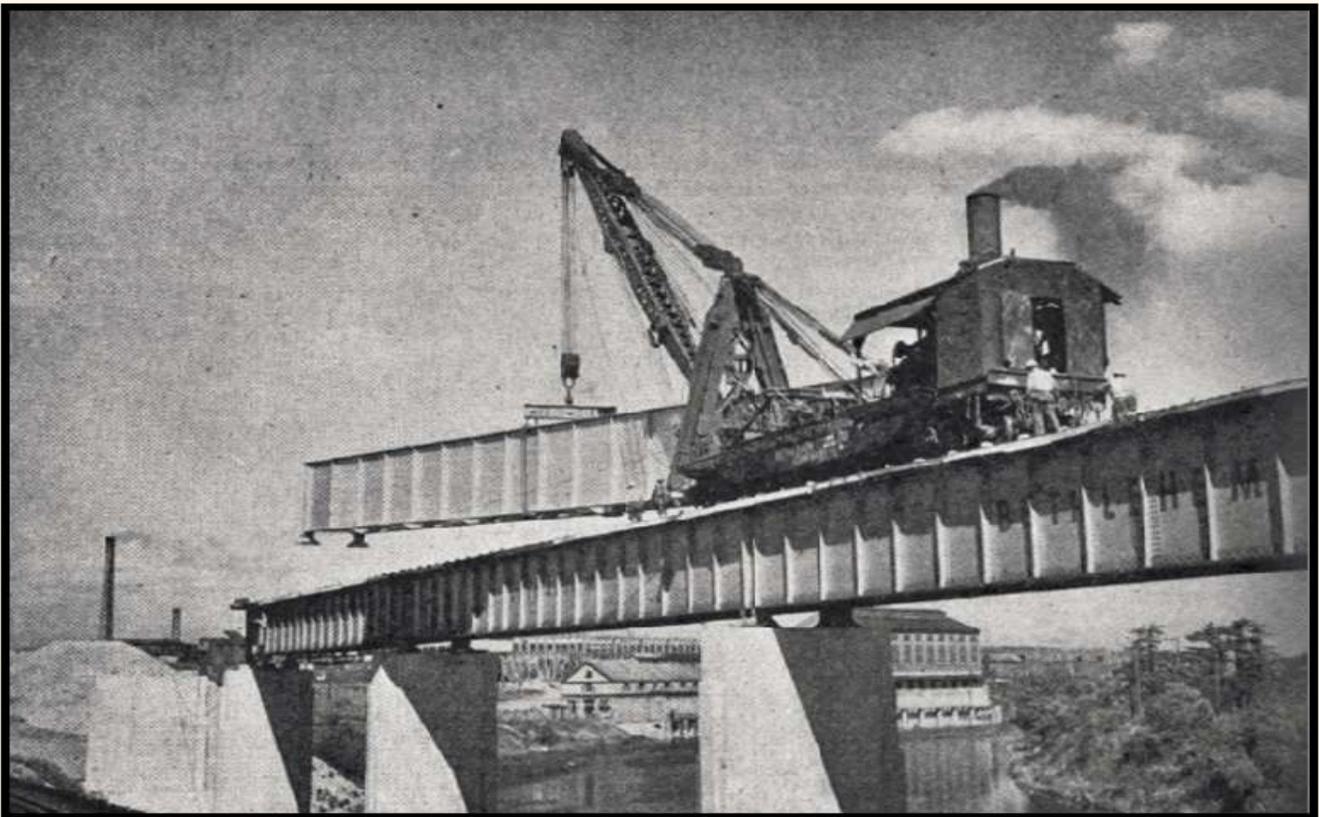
Setting the 100-ft. all-aluminium span, completely assembled, with a single 27 metric ton erecting crane. Photo from *Railway Age*, All-Aluminum Bridge Span Makes Debut⁴.
